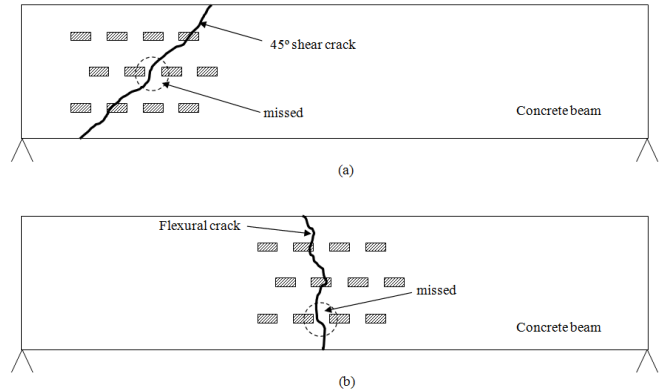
Usage of 2-D grid for monitoring (a) shear and (b) flexural cracking zones in reinforced concrete beams. The locations where the propagating crack has missed a sensitive zone are also highlighted.
